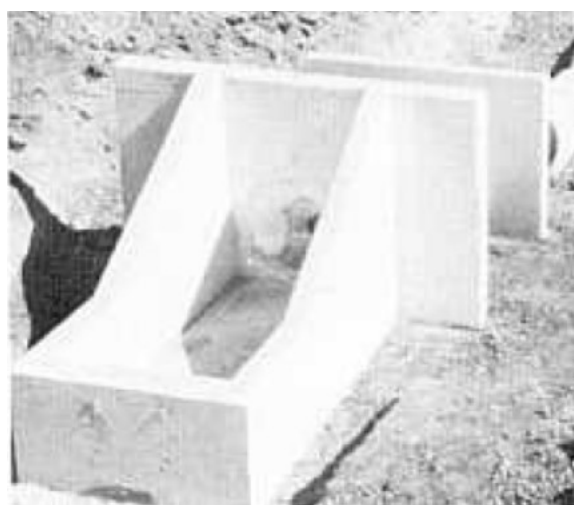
Photo graphic view of transition Type-III Inlet and outlet
